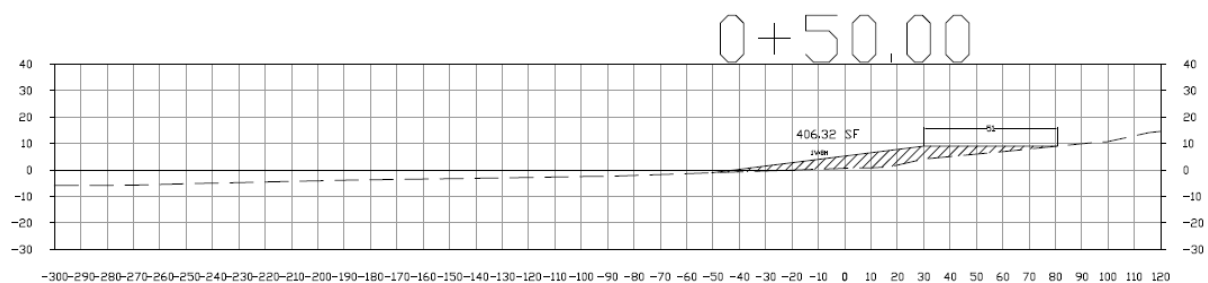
(a). Typical beach fill cross-section at Sta 0+50
